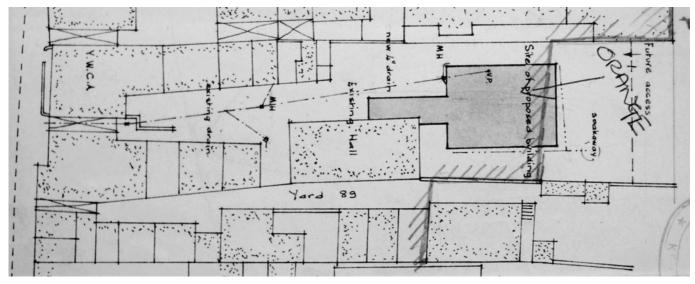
Plan application 1959 (CRO(K) WSMB/K11/S890)
